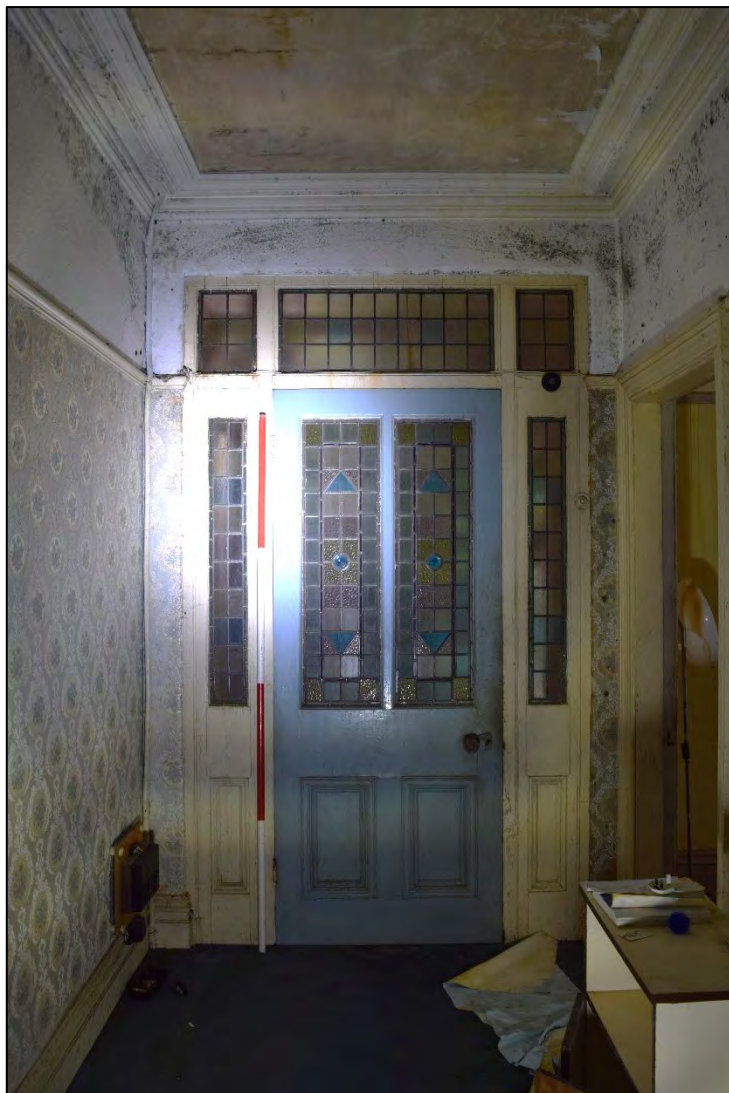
Door to Room 2 at west end of the hallway, Room 4, looking west. Scale 2m.
